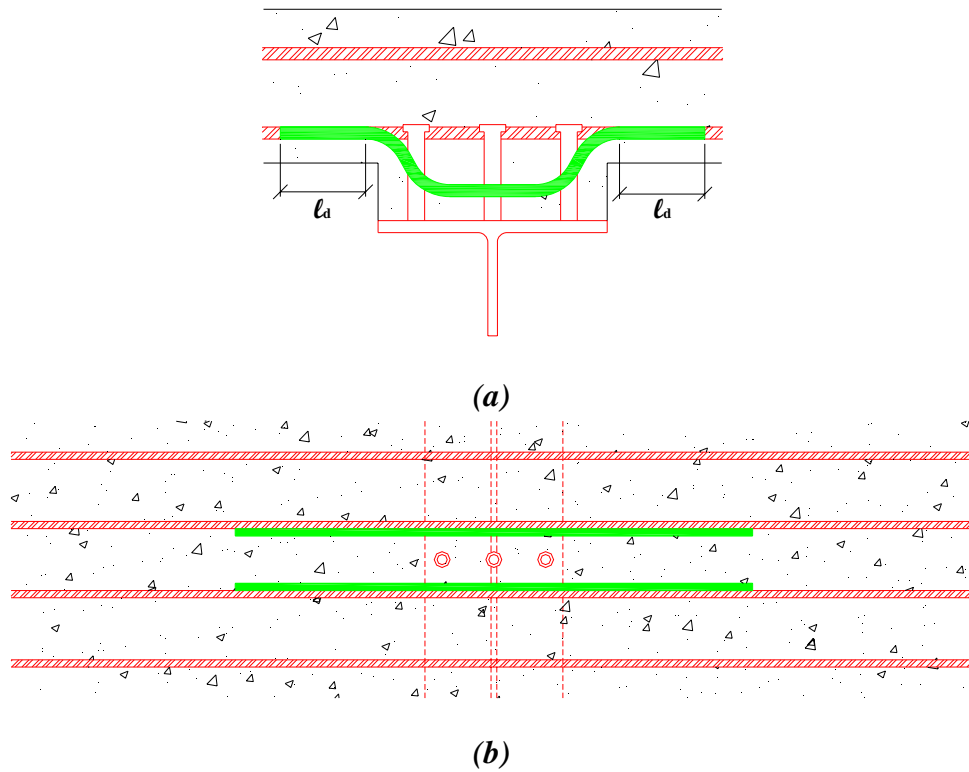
Haunch reinforcement to improve ductility (a) cross-section (b) plan view
